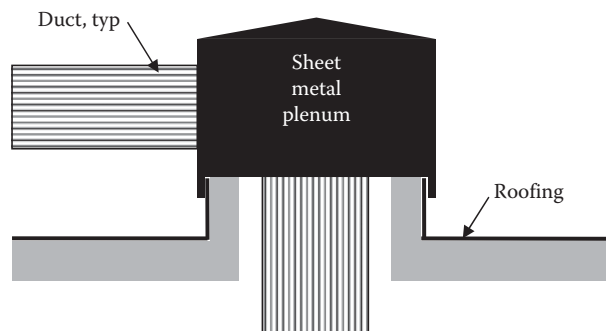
Horizontal duct penetration through a sheet metal plenum.
